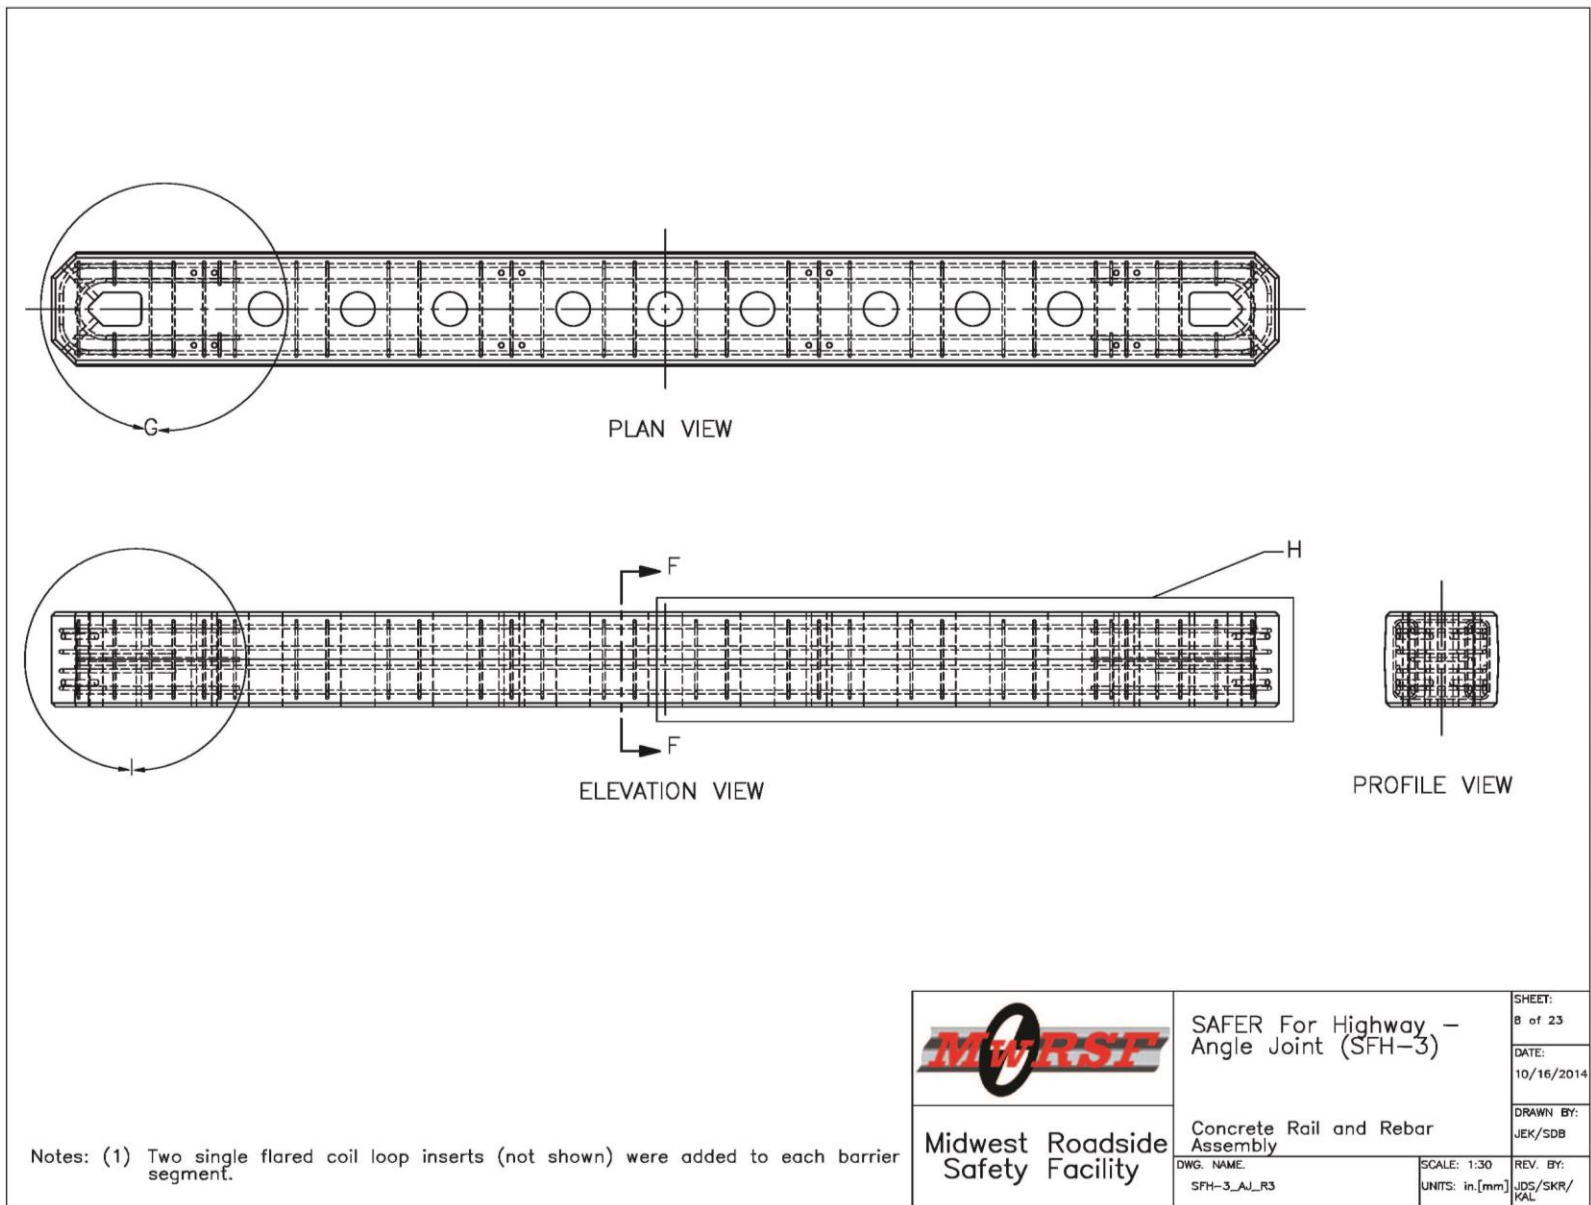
Concrete Beam and Rebar Assembly, Test No. SFH-3
